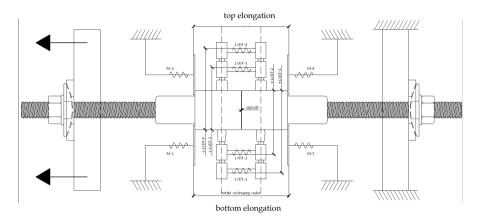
Schematic view of testing arrangement (specimen hinged in test bench)
